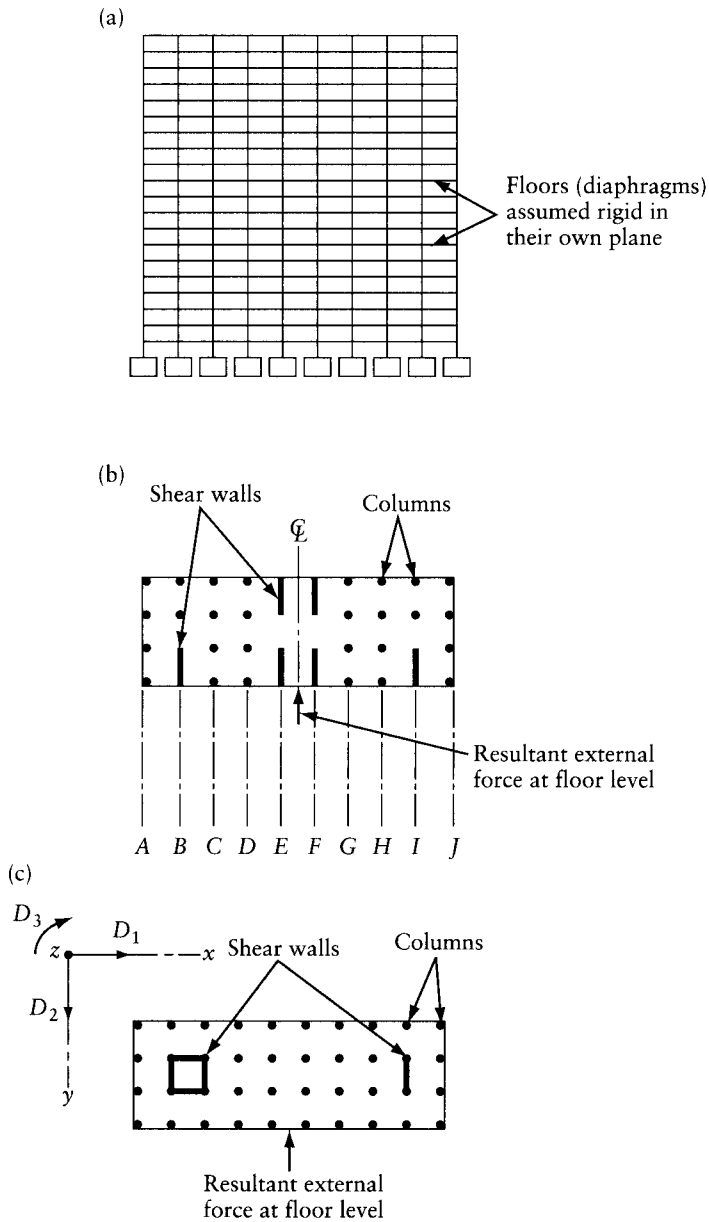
Illustration of shear walls and some assumptions involved in their analysis. (a) Elevation of a multistorey structure. (b) Plan for a regular symmetric building. (c) Plan of unsymmetrical building (rigid-body translation of the floor is defined by displacements at the coordinates D_1 , D_2 , and D_3).
